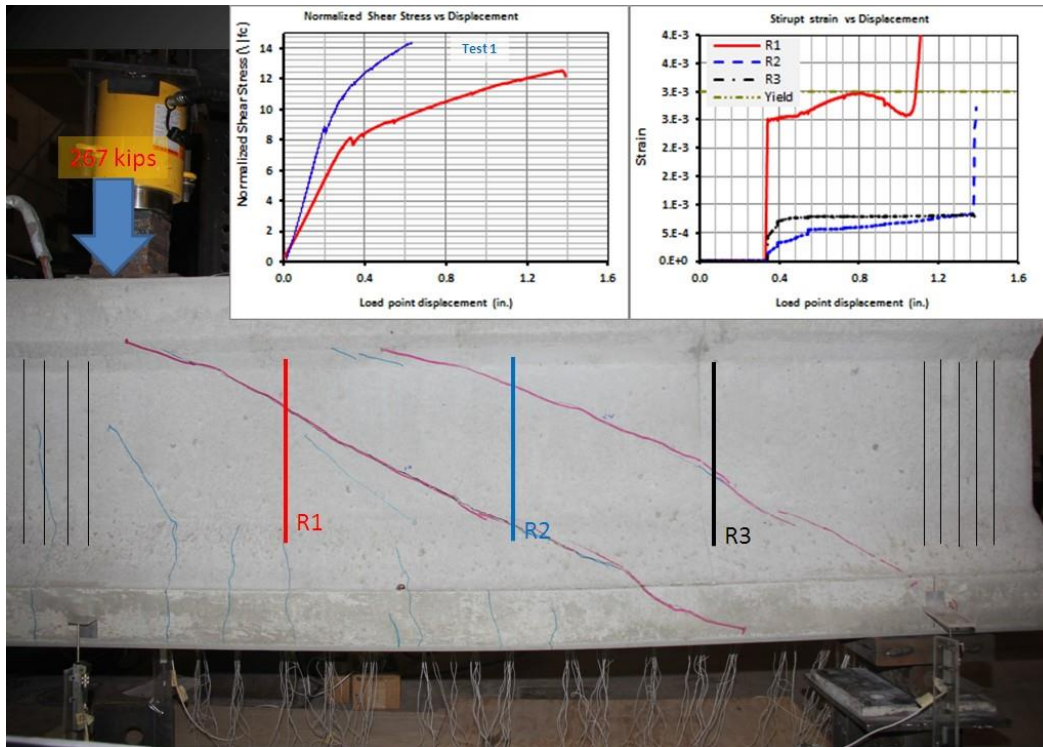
Girder 2-Test 2 peak load prior to failure
